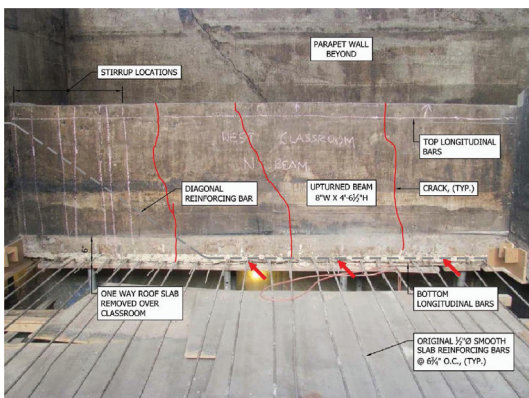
Unity House classroom after roof slab removal (red arrows point to horizontal splitting above longitudinal bars of upturned beam in zone without stirrups)
